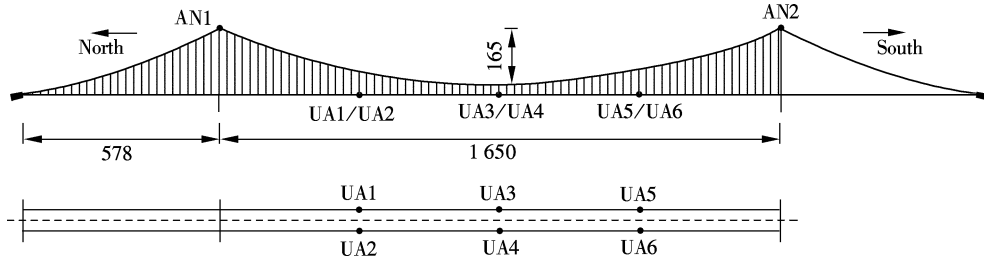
The arrangement of anemometers in a suspension bridge (unit: m)
